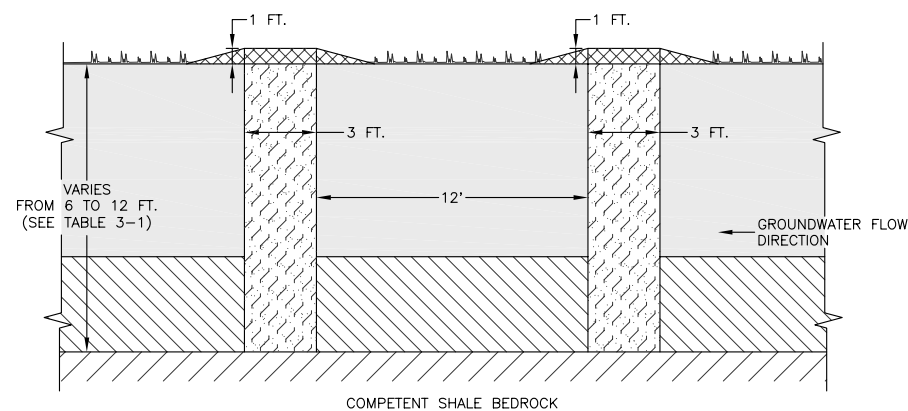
DETAIL A – BIOWALL INSTALLATION IN AREA OF DRAINAGE DITCH
